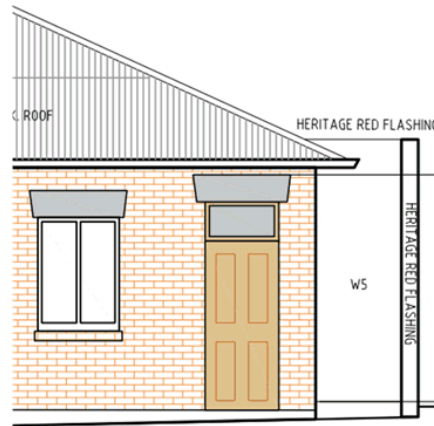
Extract of the proposed western elevation showing the difference in height of the existing cottage side boundary wall and the proposed extension boundary wall (labelled with 'heritage red flashing'). Source: Applicant's documentation, Shurman Design, drawing A06, 'Elevations Proposed', 20.10.2025.
